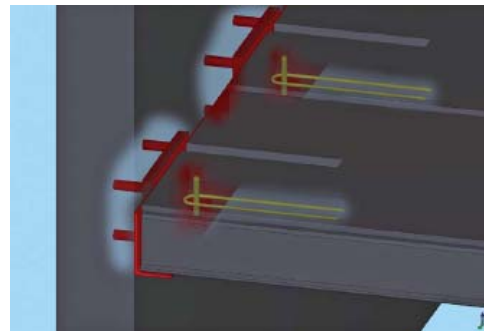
Principle connection of deck elements with interior concrete shear wall.
